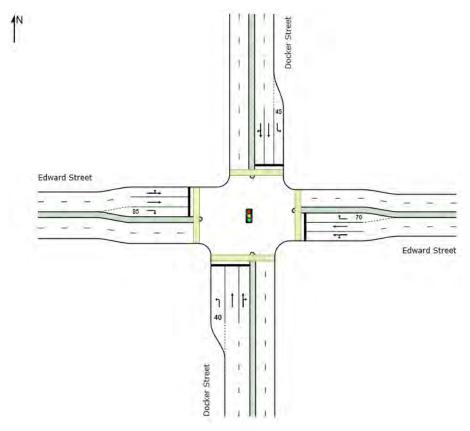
Edward Street/Docker Street SIDRA intersection layout
